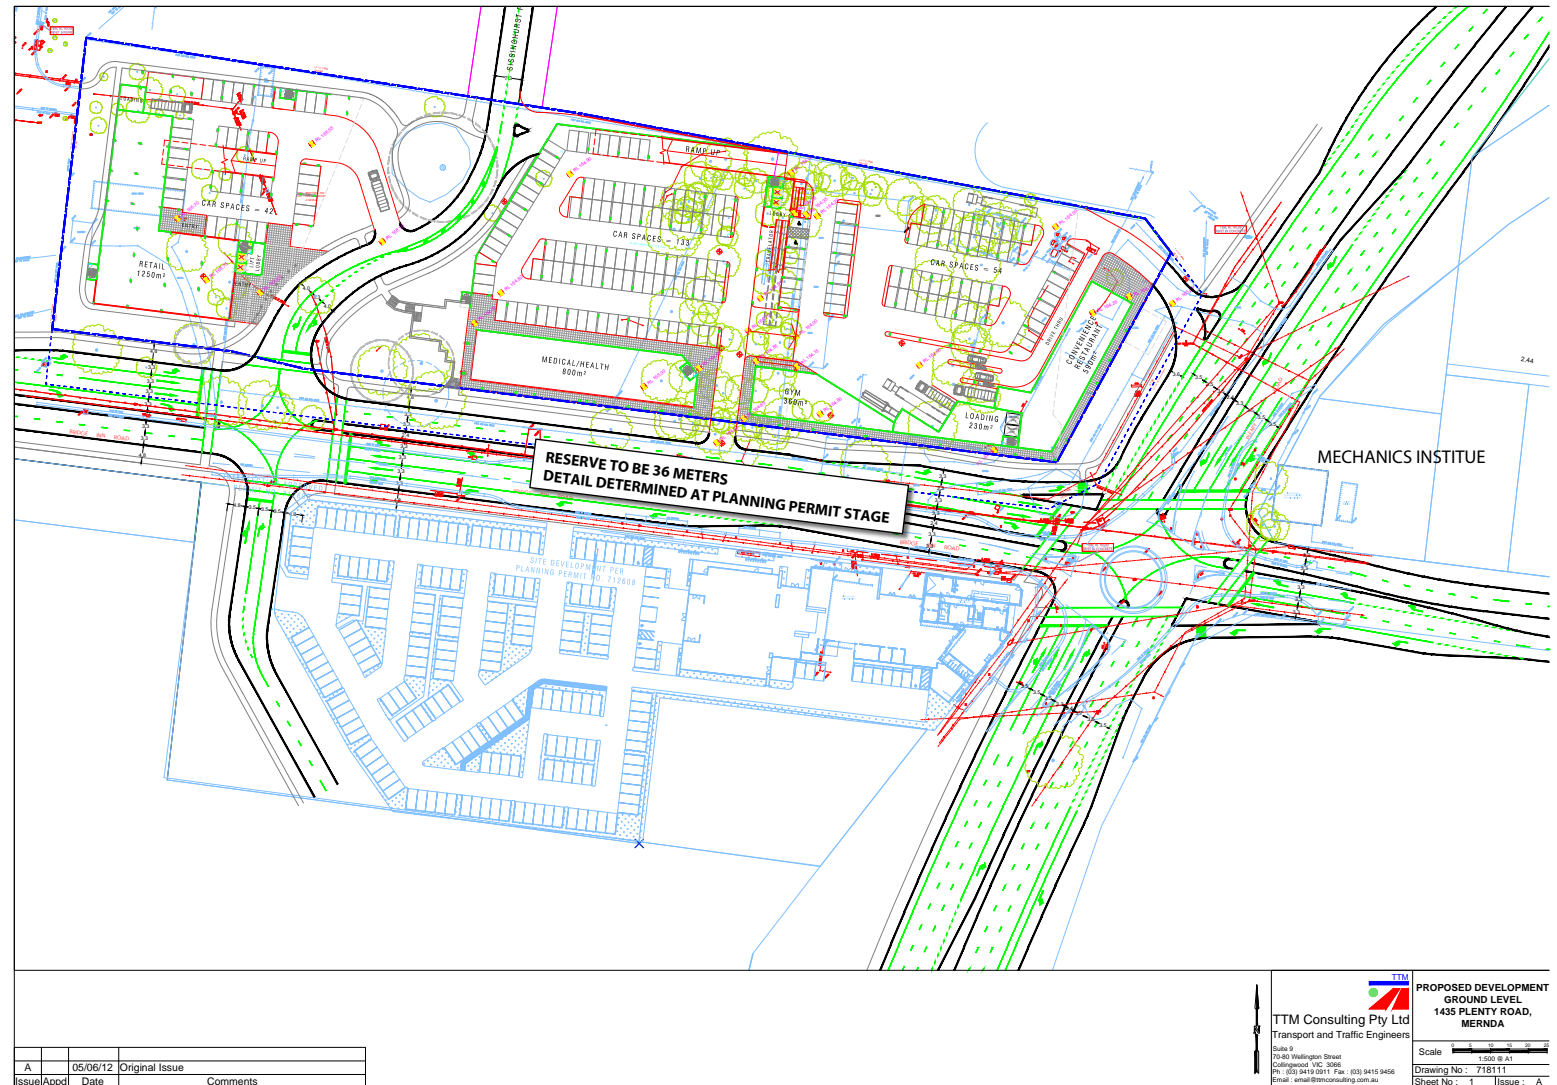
Proposed Intersection 1435 Plenty Road, Mernda
